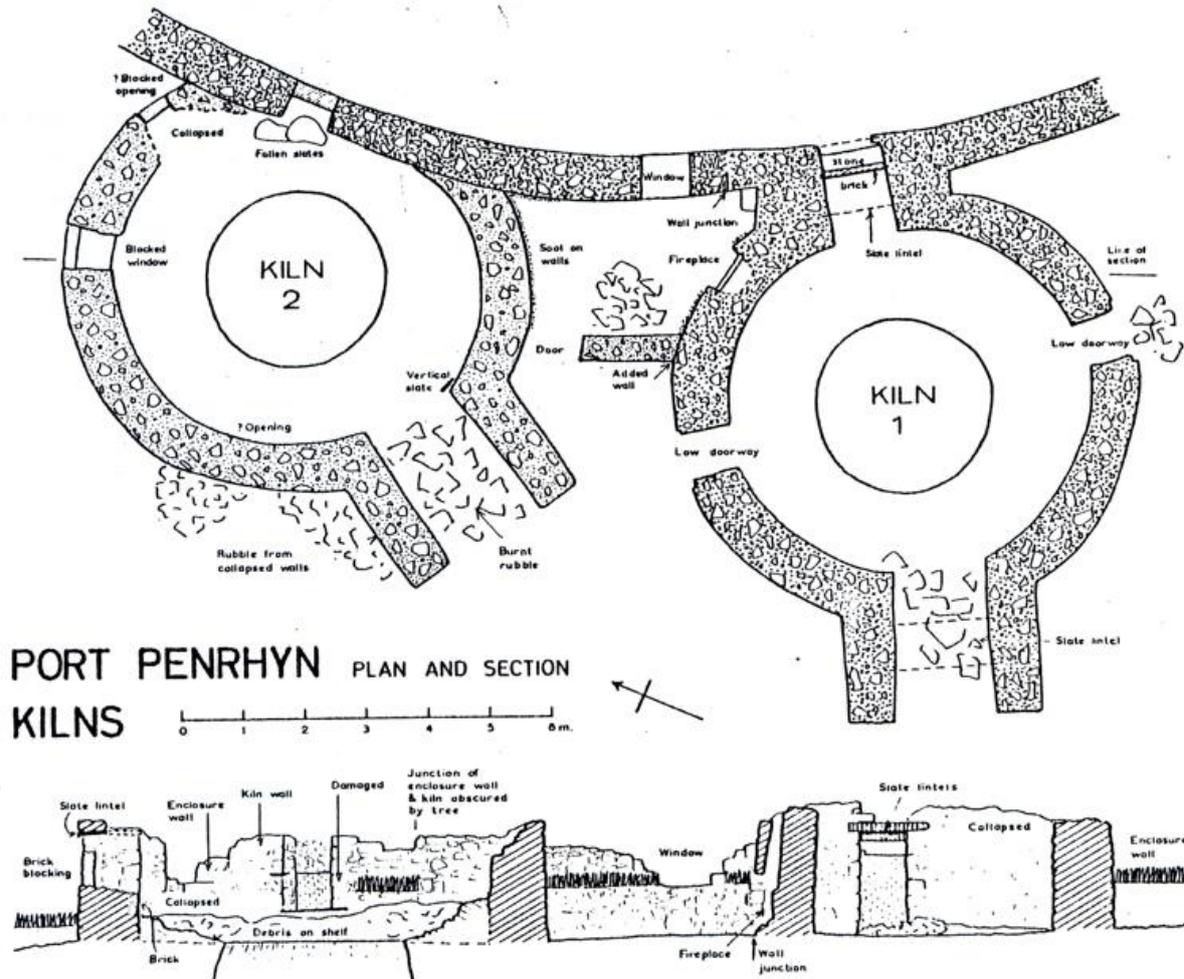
Plan and section of the Port Penrhyn kilns. (1980)
